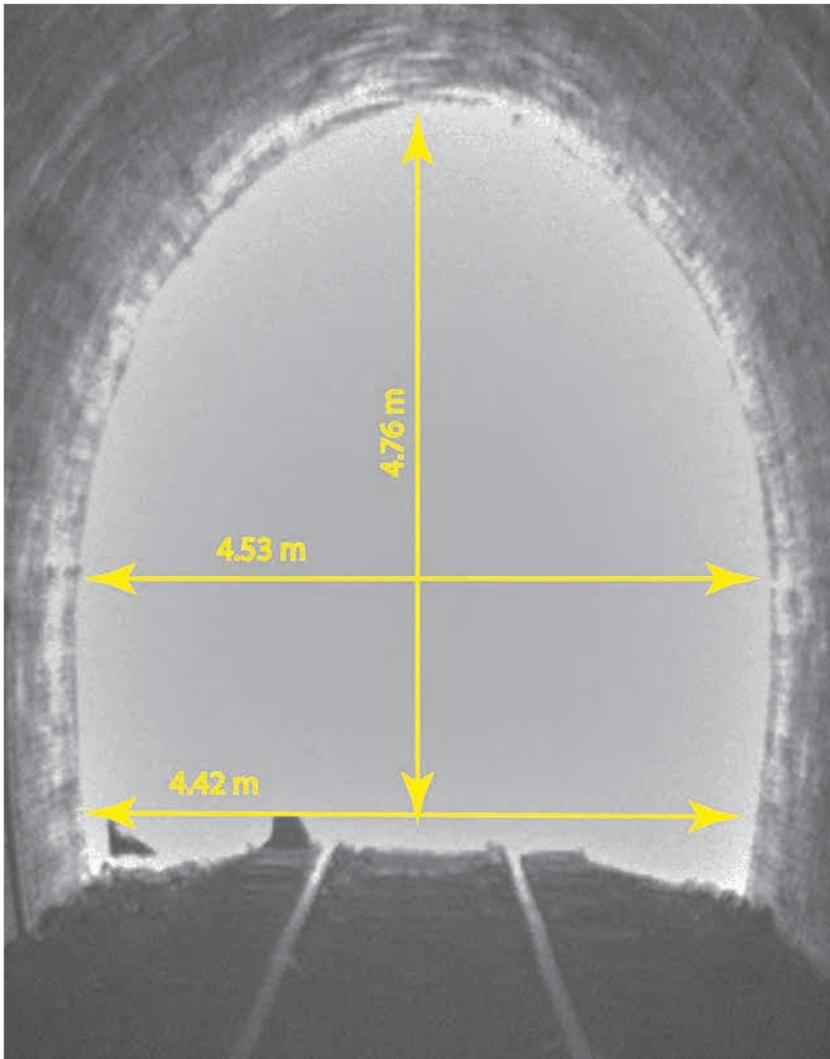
Tunnel cross section is of “horseshoe” shape.. This section is typical of both brick and concrete lined single track tunnels of the period.
